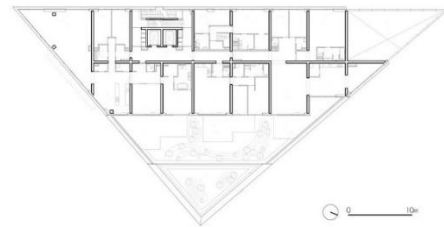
1st Floor Plan of Haut (Url-1, 2024).
